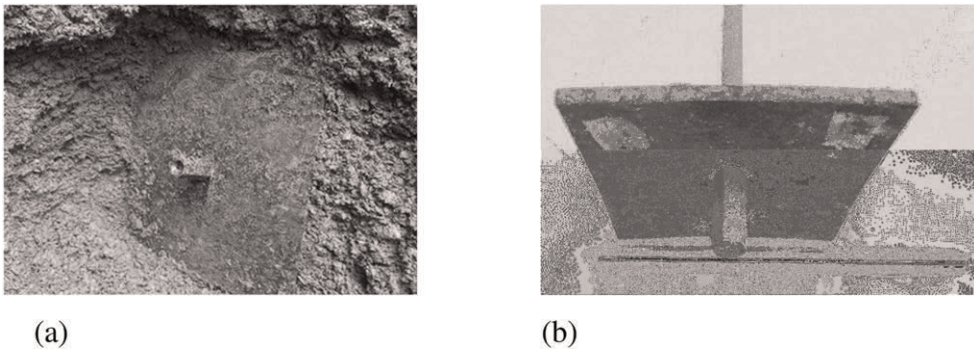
(a) Exhumed Anchor 28 and (b) Deformed Anchor 14 following exhumation.
